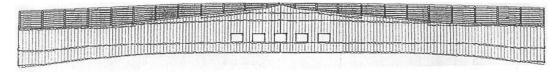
Reconstruction of the prospect of Schaffhausen Bridge first design
